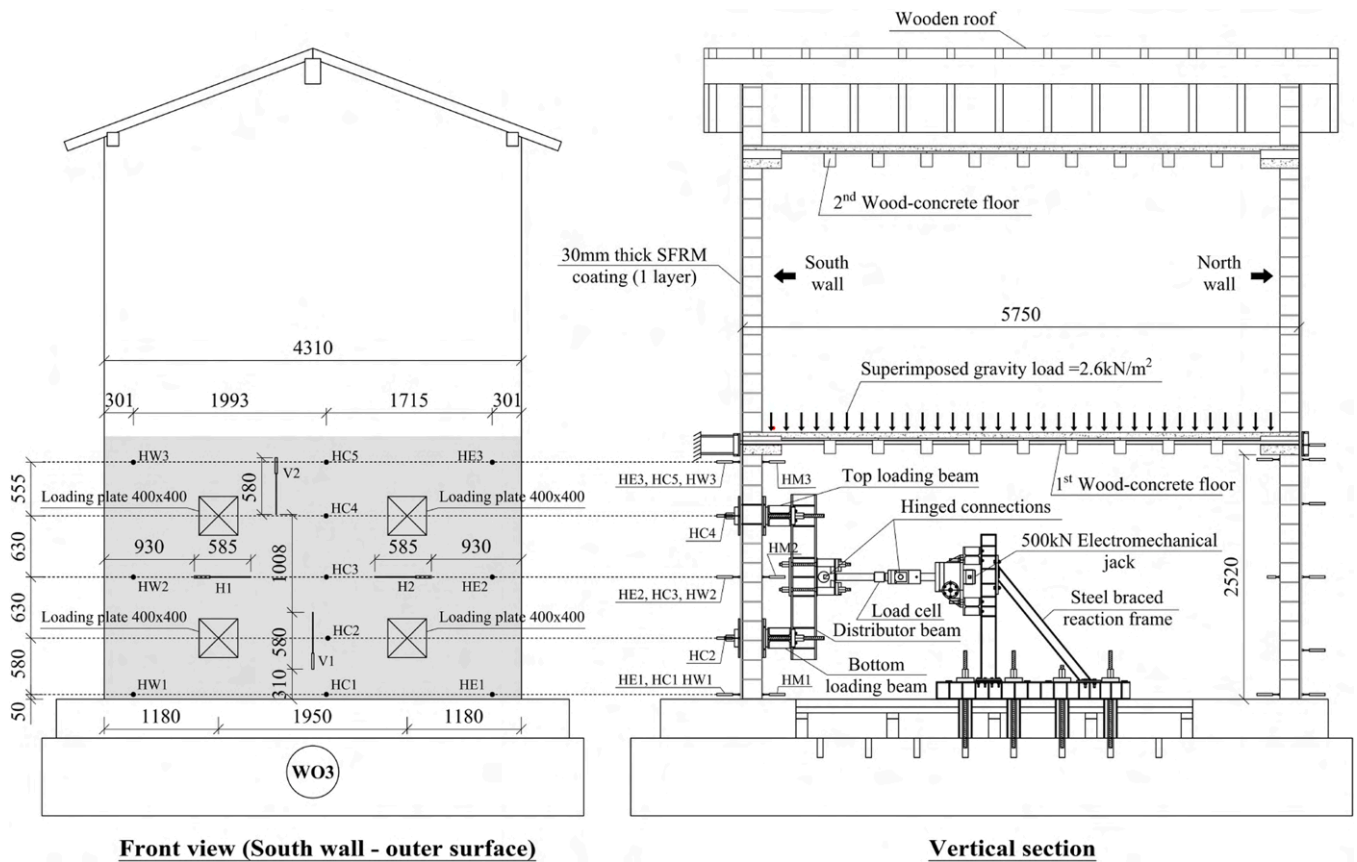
Test set-up adopted for the two-way spanning wall (dimensions in [mm]).
